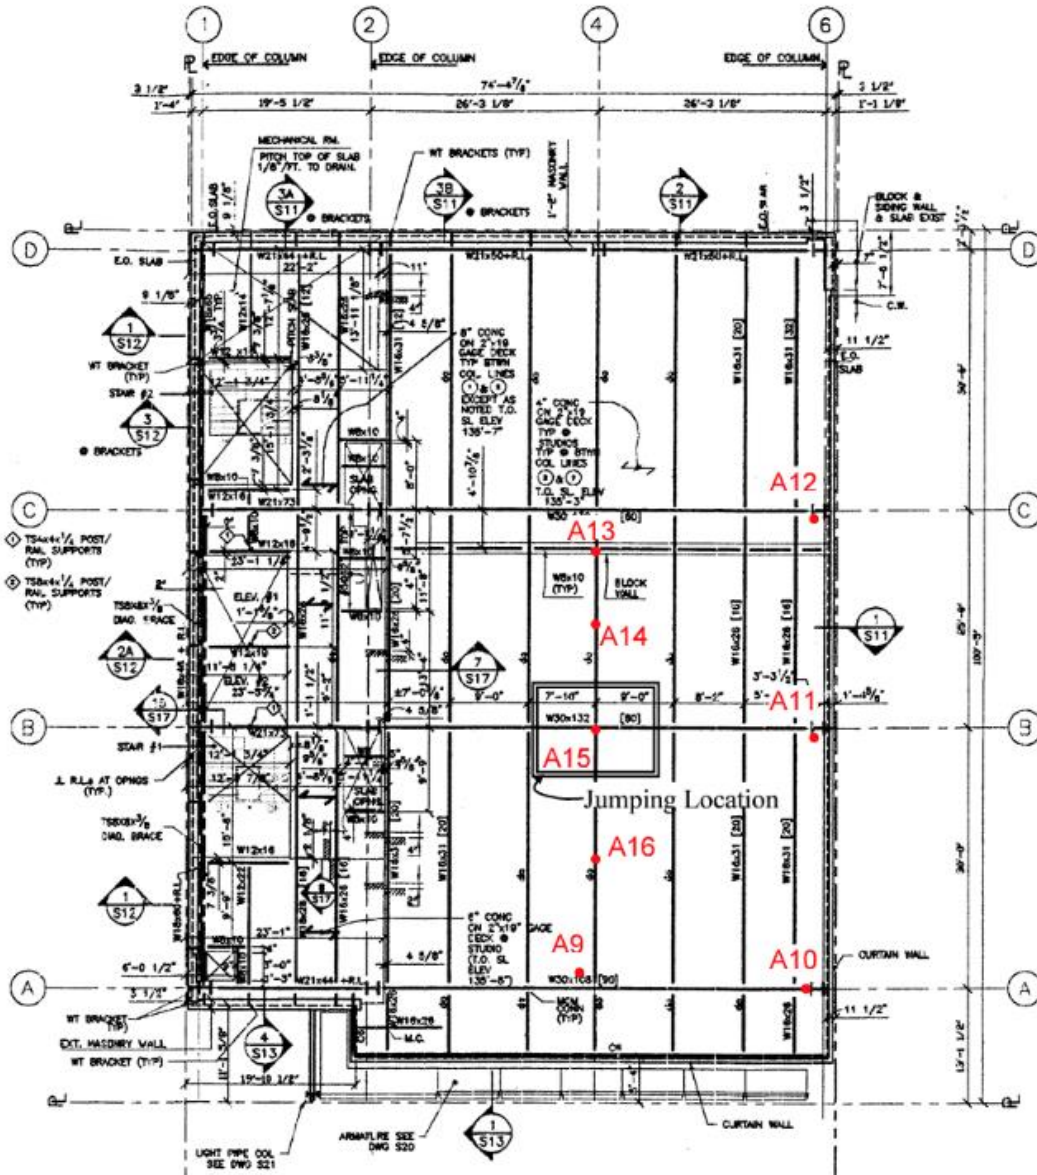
Location of Accelerometers on the 9th Floor from In-Situ Testing
